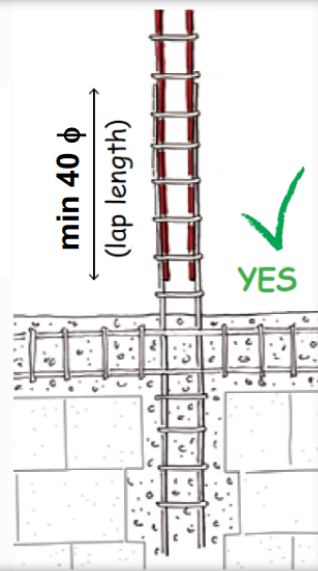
Construction of Reinforced Concrete Elements - Lap Length
